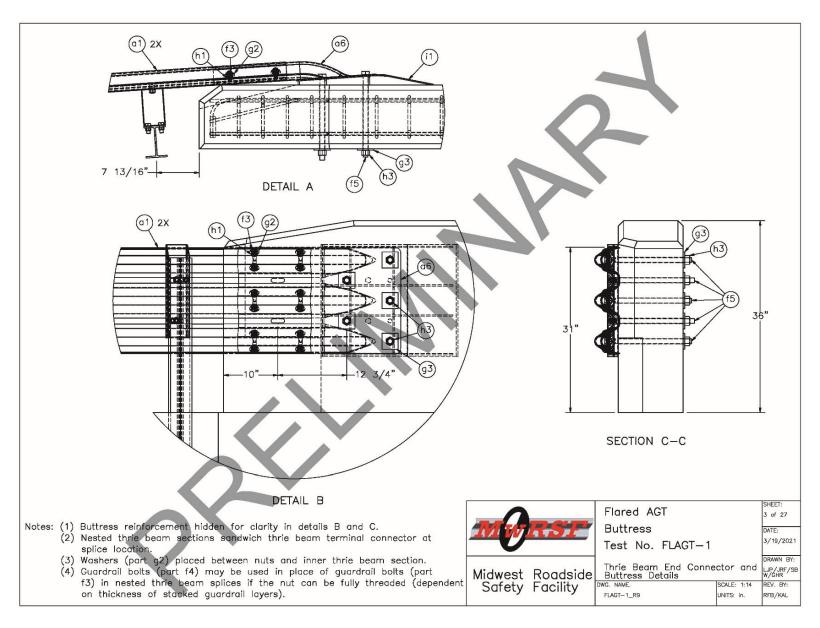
Thrie-beam End Connector and Buttress Details, Test No. FLAGT-1
